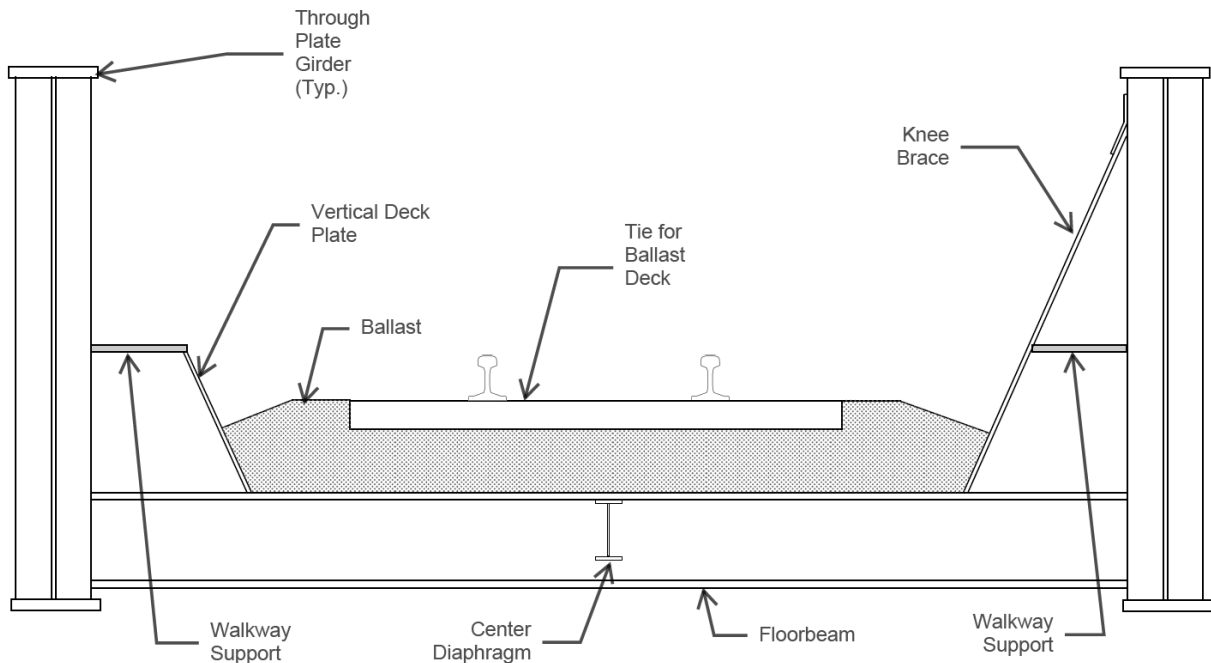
(b) – Through Girders with Ballast Deck and Without Stringers
